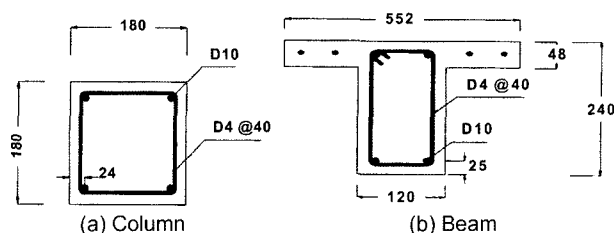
Geometry, dimension and detail of sections. (unit : mm)
